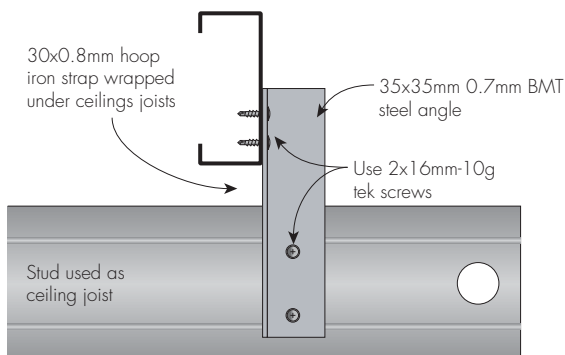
Ceiling Continuous Joist to Hoop Iron Strap
